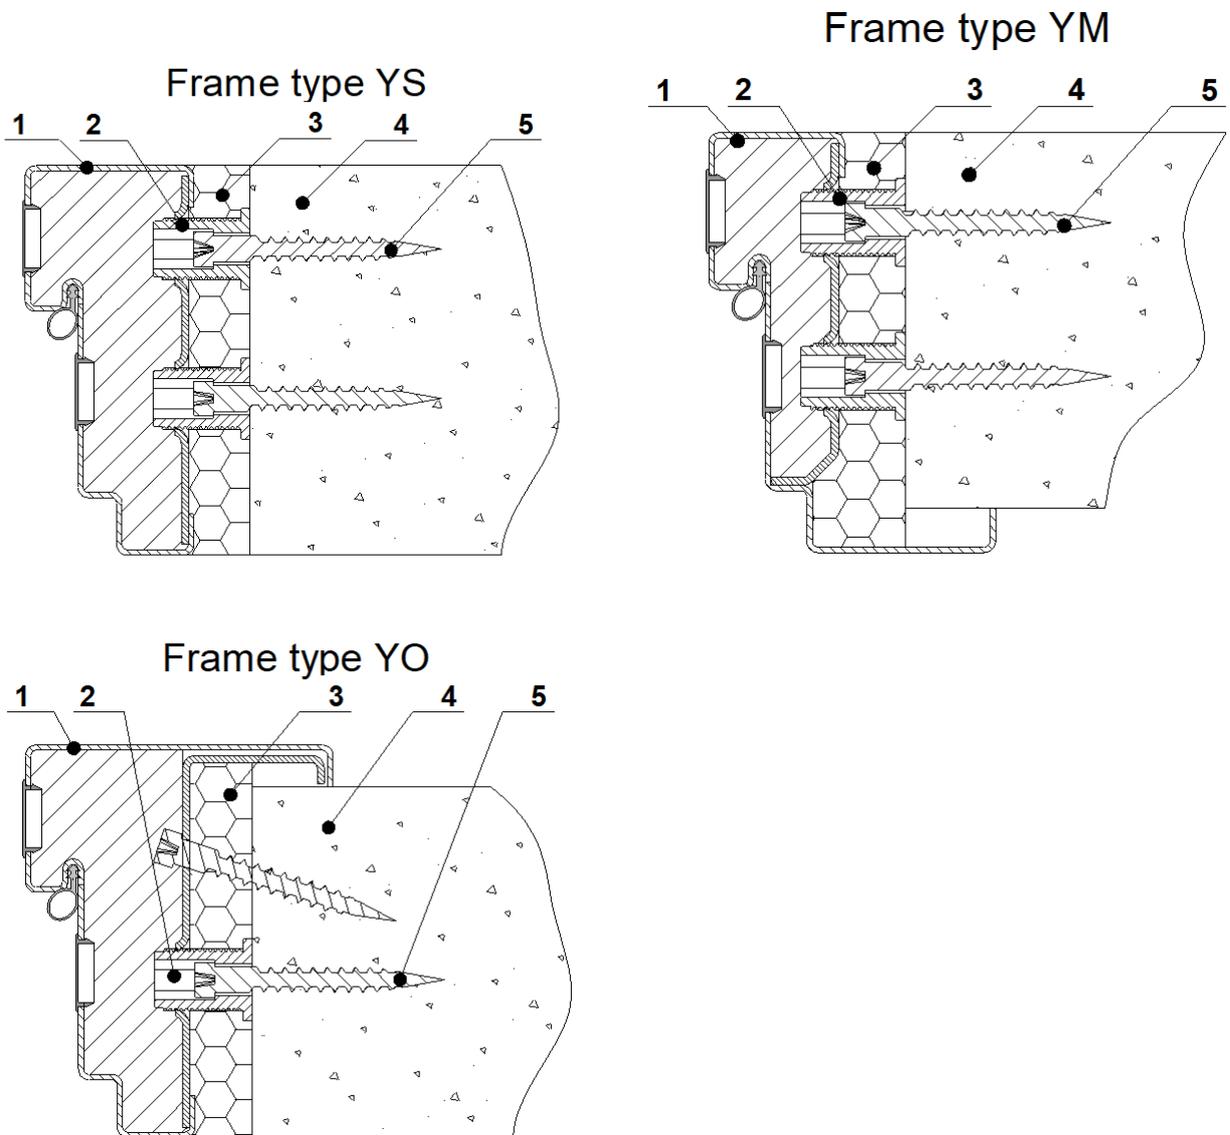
Fixing the door frame into a concrete, lightweight block or stone wall
